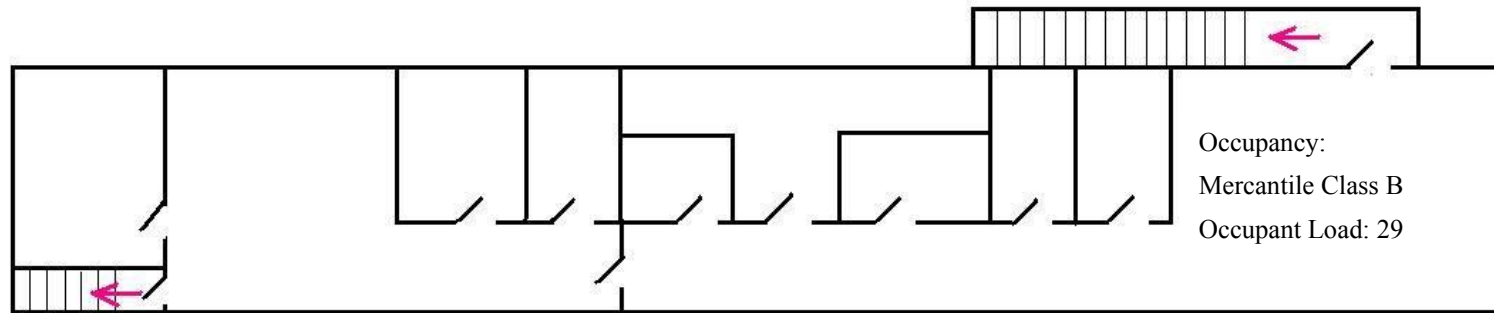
Building layout, relevant boundary, occupancy type and occupant load on ground floor
